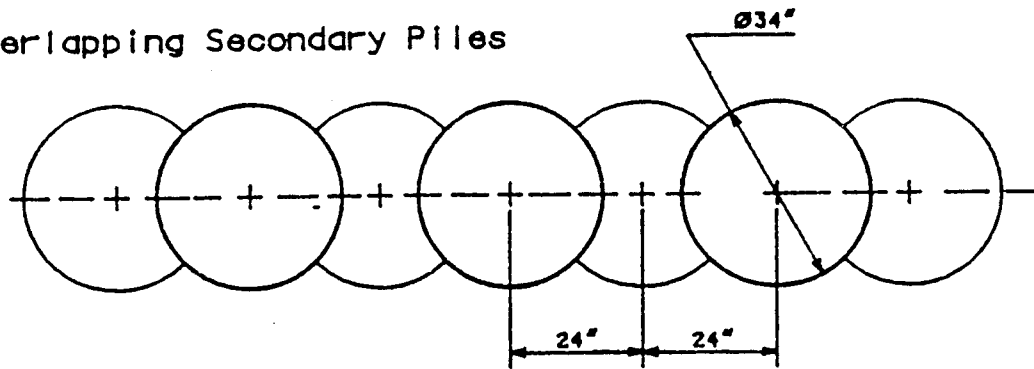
Elevation of the cut-off wall showing main construction parameters.
